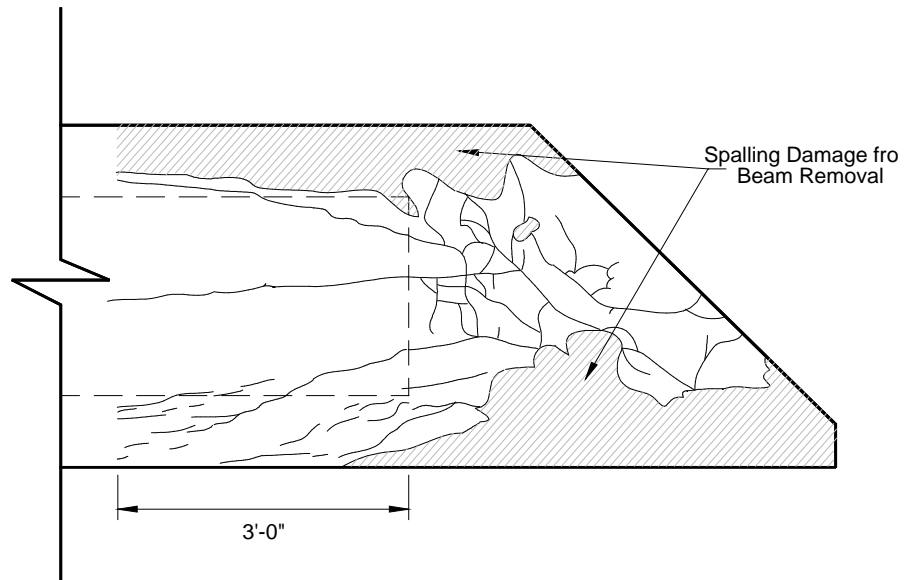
Cracking in Bottom Flange of Box Beam 3 - Untested End
